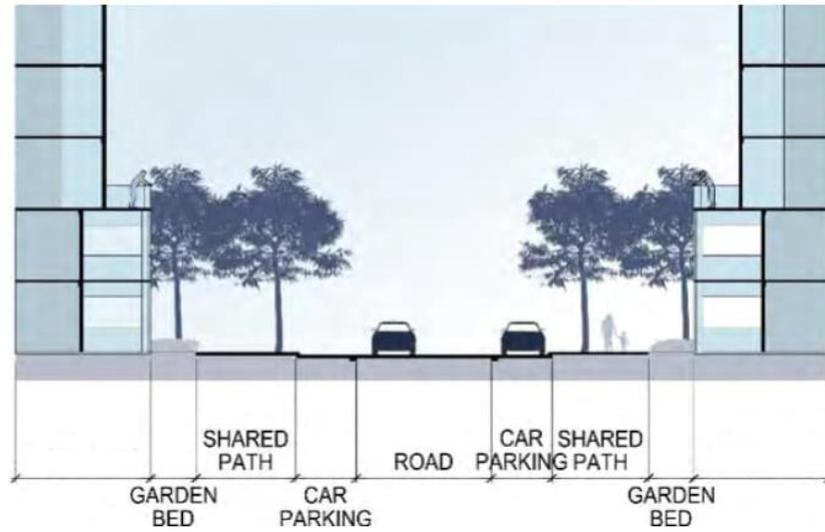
Central Streets (Plan Extract and Indicative Section)
